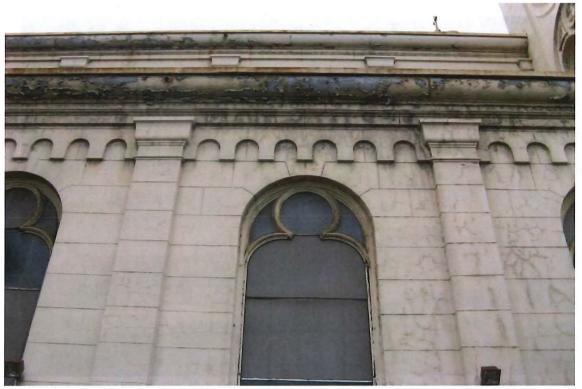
East nave façade, showing soiling, water staining and hairline cracking of stucco.
